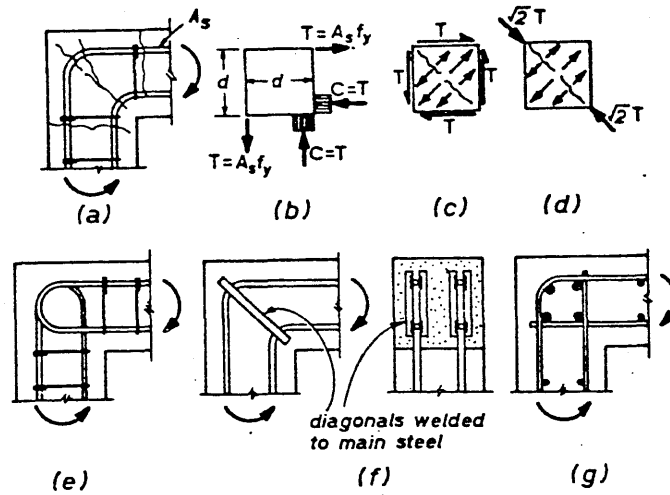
Actions and details of knee joints subjected to closing moments. (a) Typical cracks. (b) Internal forces. (c) Crack due to shear. (d) Splitting crack. (e) Overlapping hoops. (f) Diagonal stiffeners. (g) Transverse bearing bars. Source Ref. [3]
